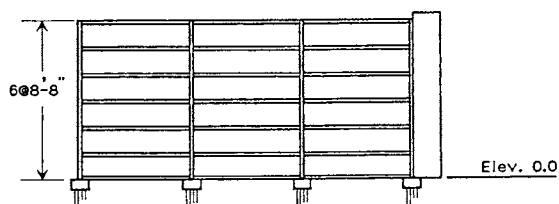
Elevation of Tower I of Airport Plaza Hotel
